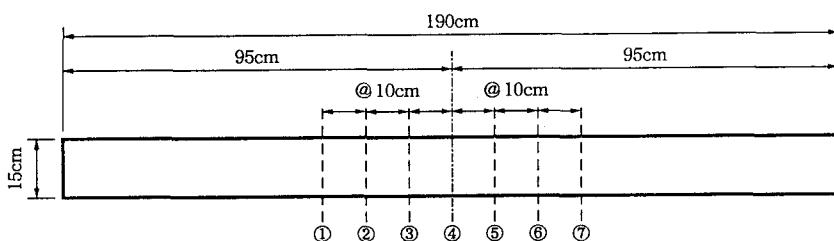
Dimensions of test specimen and the section numbers at which the specimen was cut.
